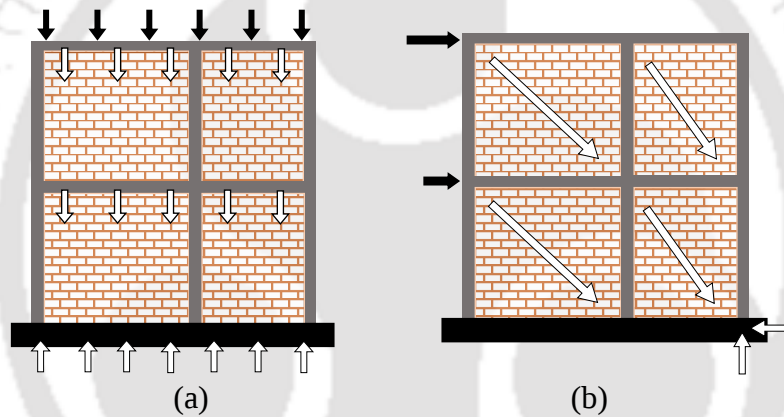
Flow of loads in CM walls: (a) vertical forces, (b) lateral forces.
